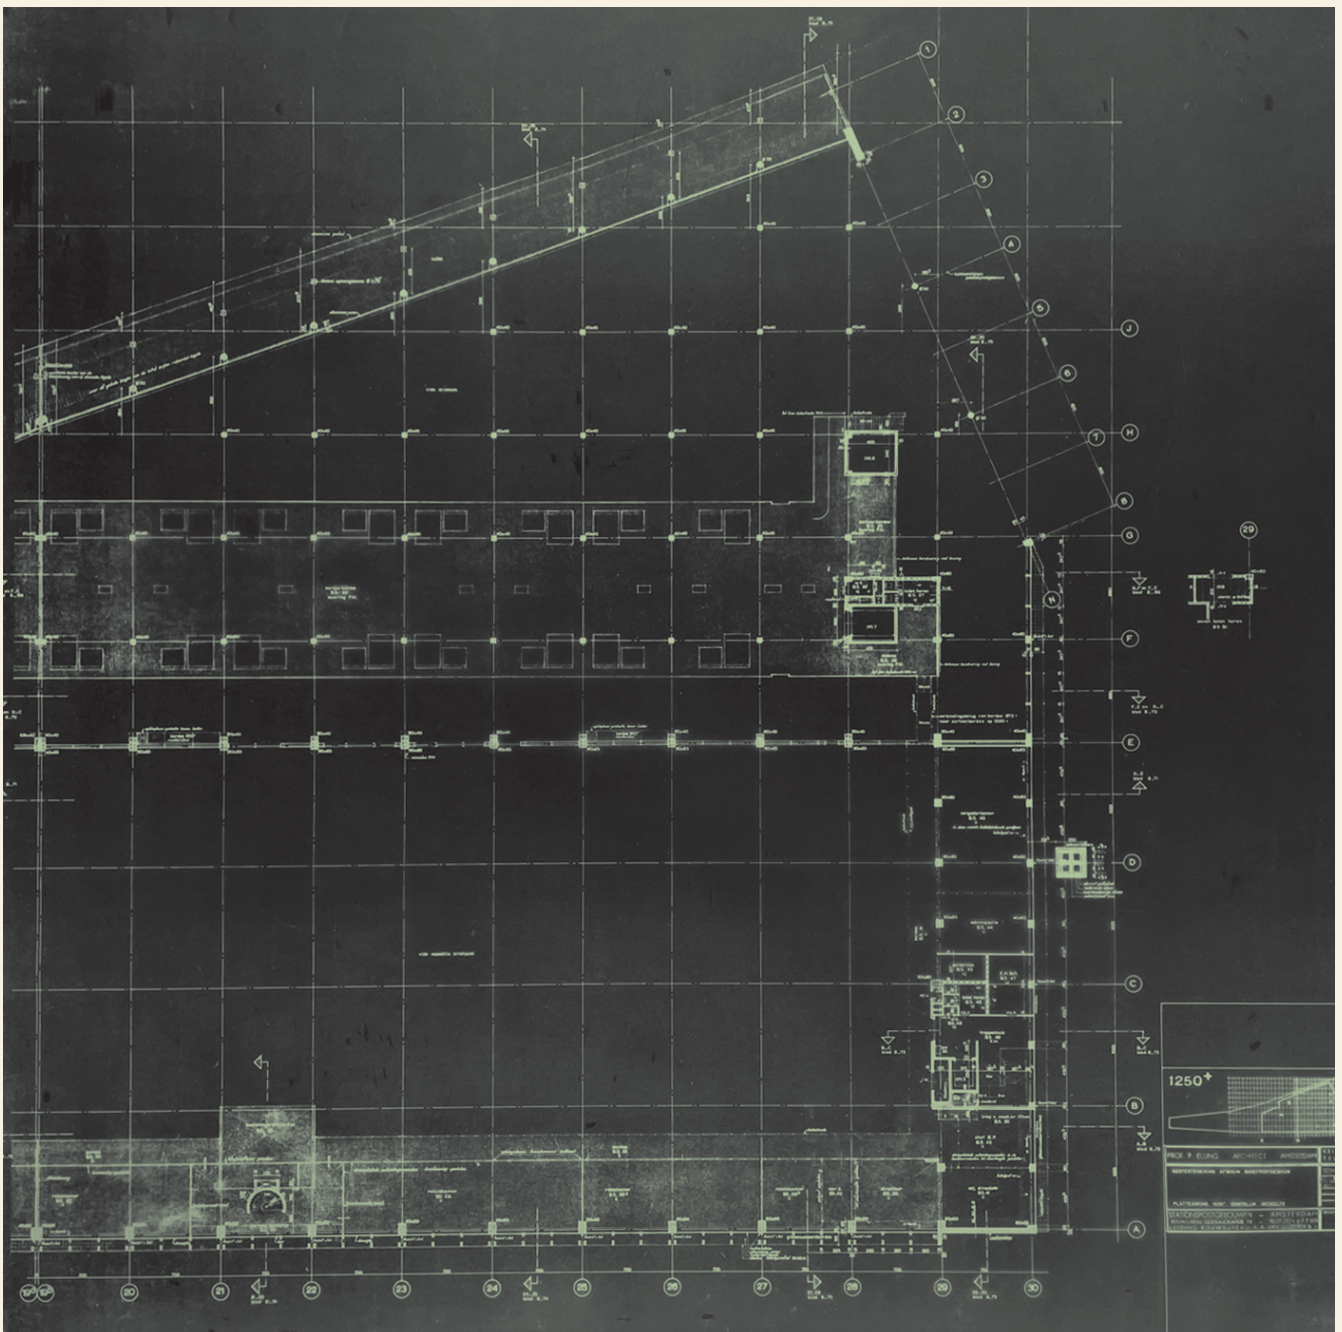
Letter post building: second floor plan. Source: HNI-MELkt121.1
